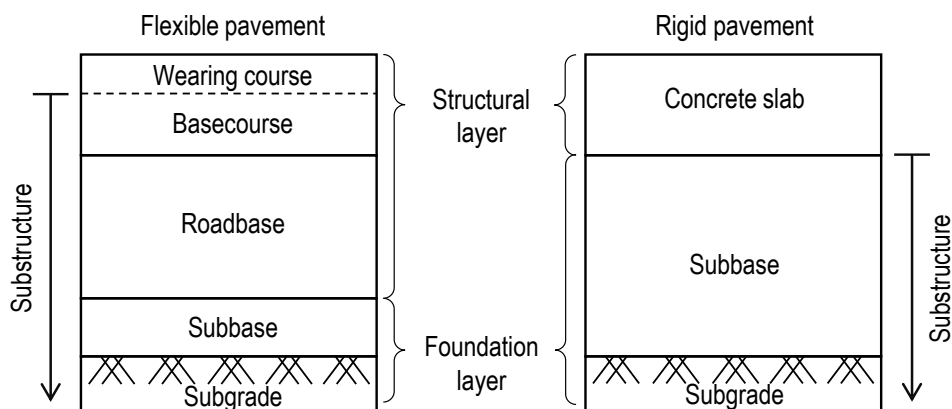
Structural and foundation layers, and substructure, of flexible and rigid pavements (adapted from O'Flaherty (1967))
